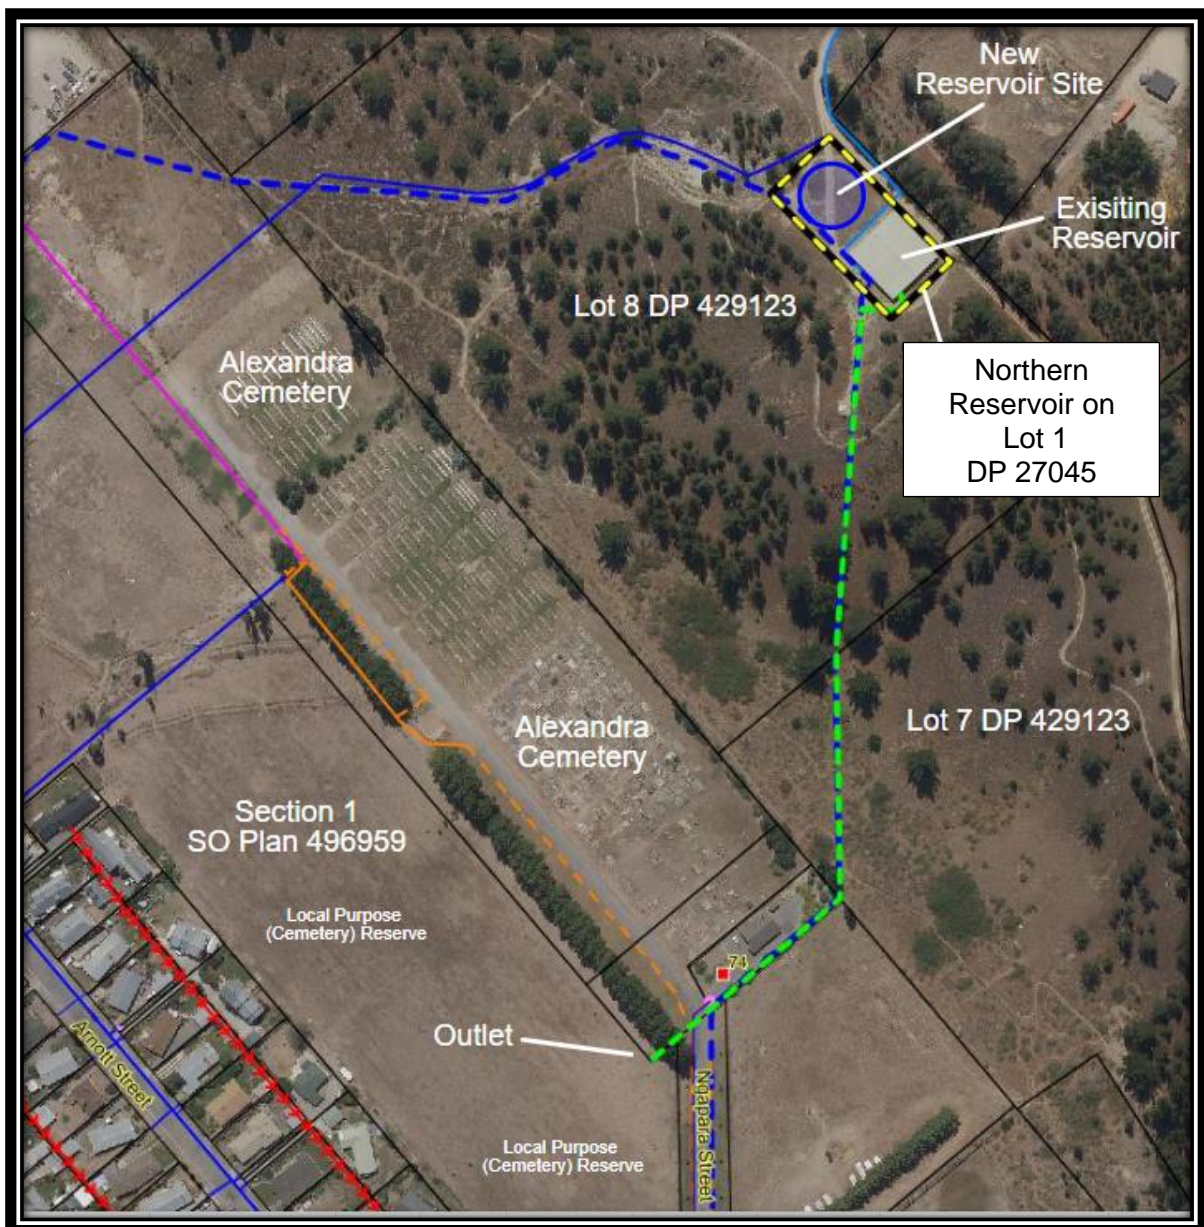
Plan of the overflow pipe showing the location of the outlet on Section 1.
